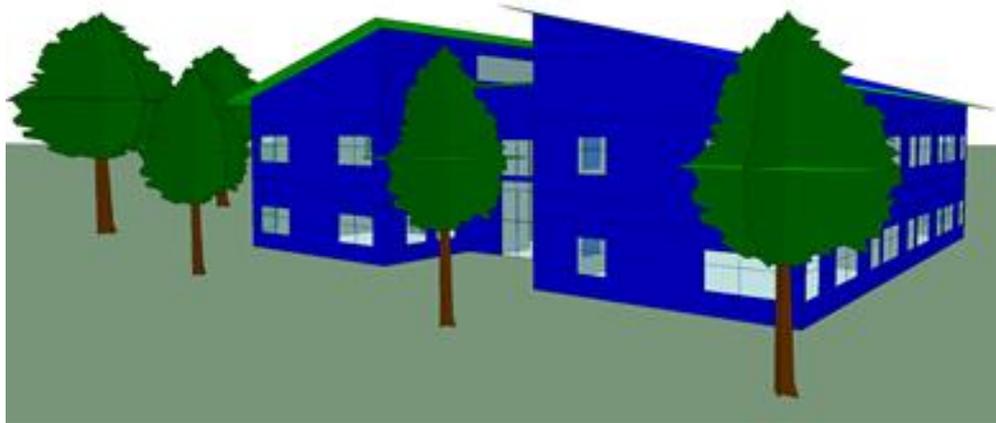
The layout of prefabricated façade modules in the virtual demo building in Glasgow (Source: TUM)
